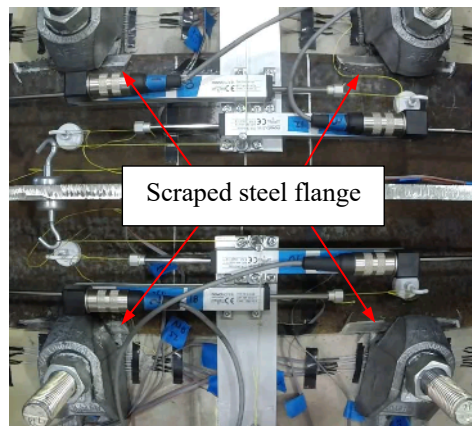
Damage of steel flange in Test 5-M24-2C-RH-LC at 1.28 in. slip
